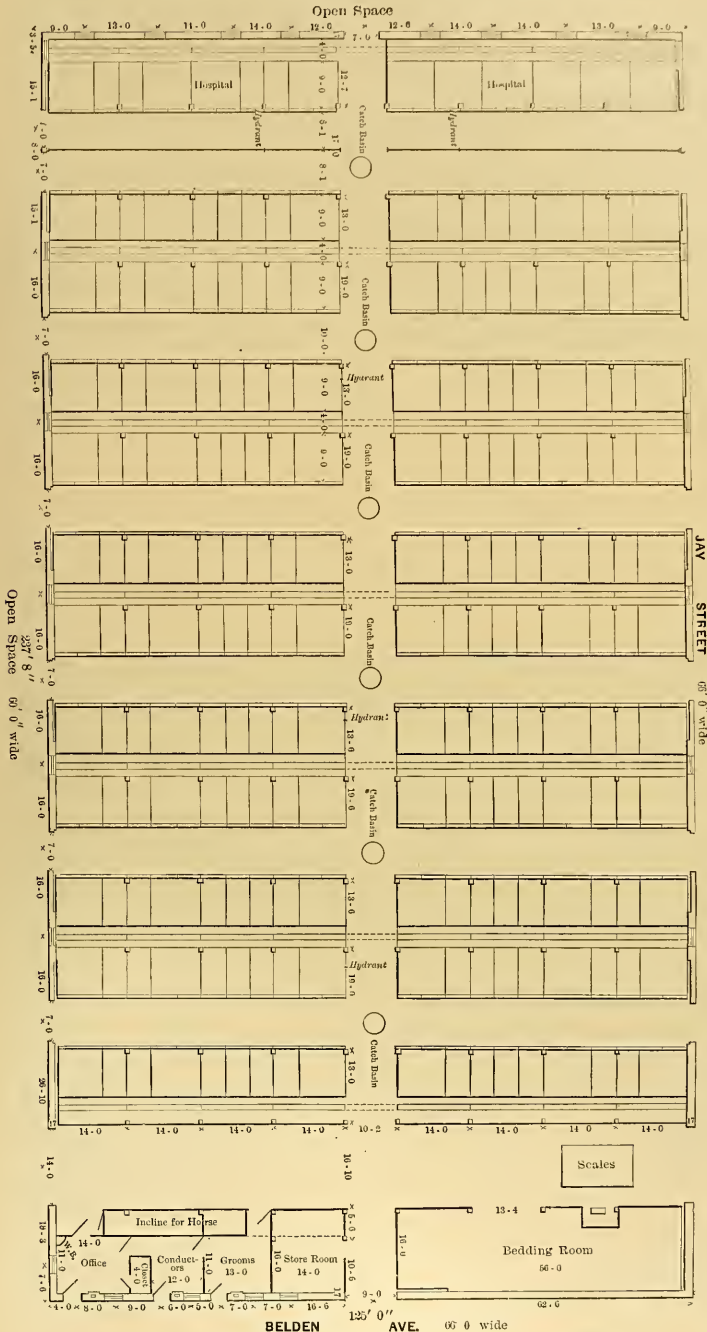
GROUND PLAN OF NORTH CHICAGO CITY RAILWAY STABLES.
